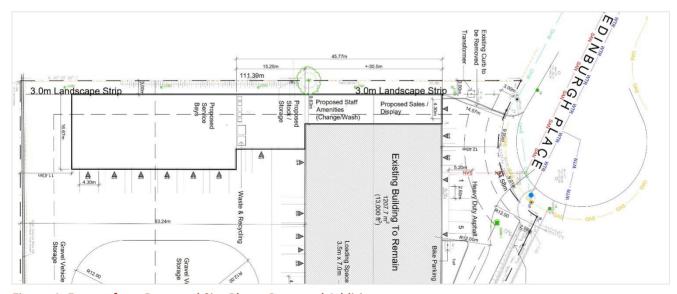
Extract from Proposed Site Plan - Proposed Addition
